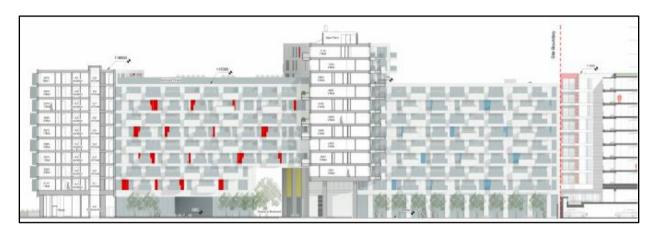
Extract of proposed elevation from the Design Statement, prepared by TOT Architects.
